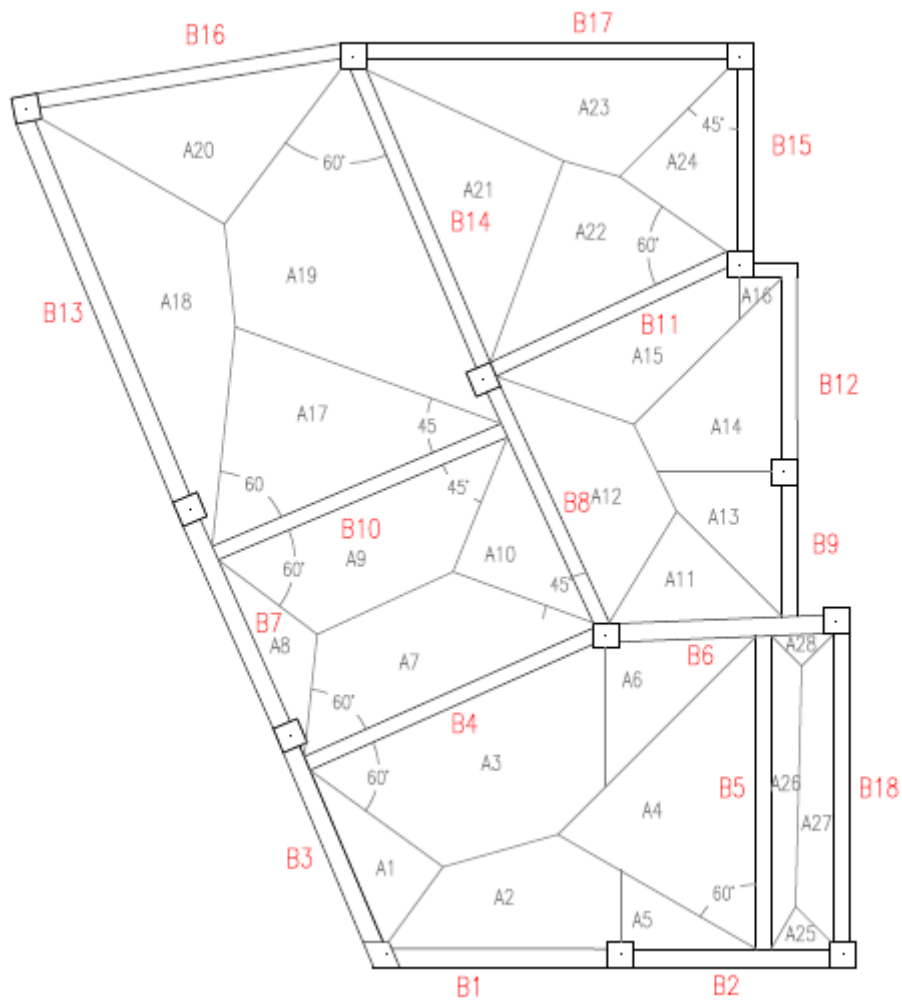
Distribution of Slab Load to the Beams-Ground Floor-Shops (z=5.06m)
